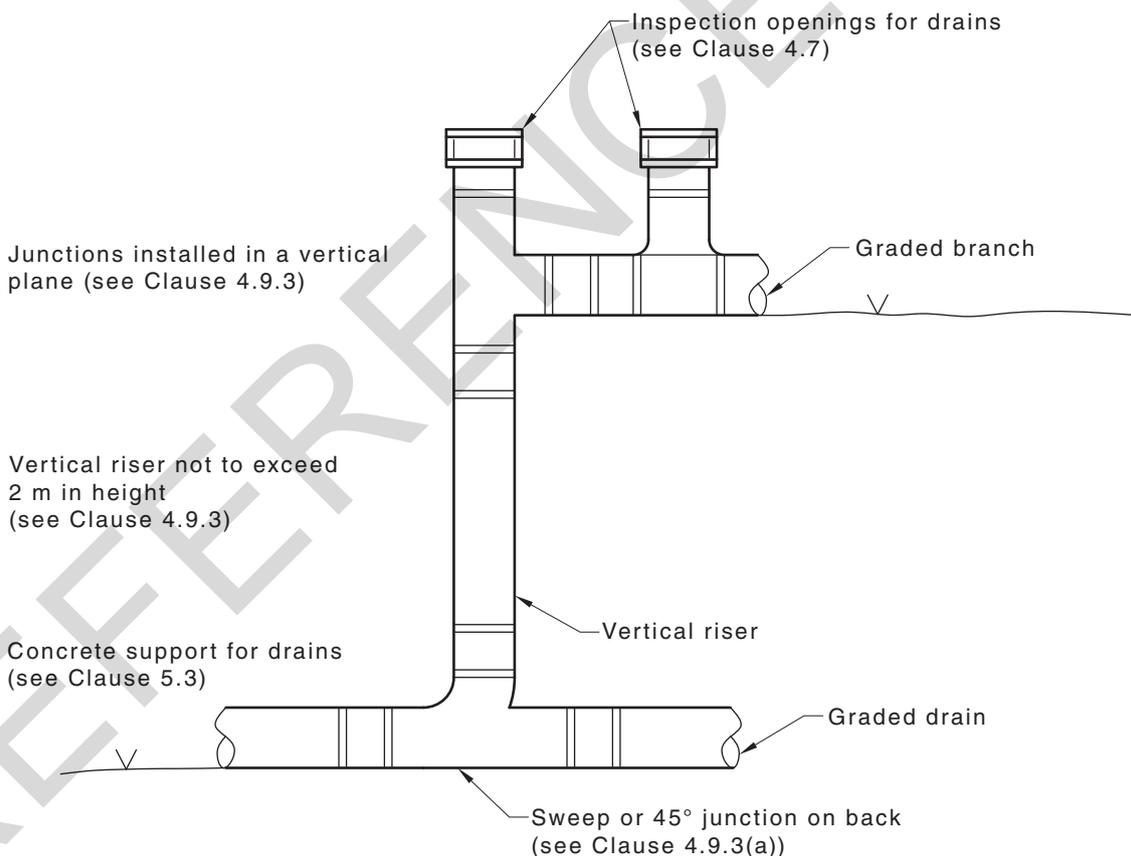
TYPICAL VERTICAL JUMP-UP FROM MAIN DRAIN TO GRADED BRANCHES
